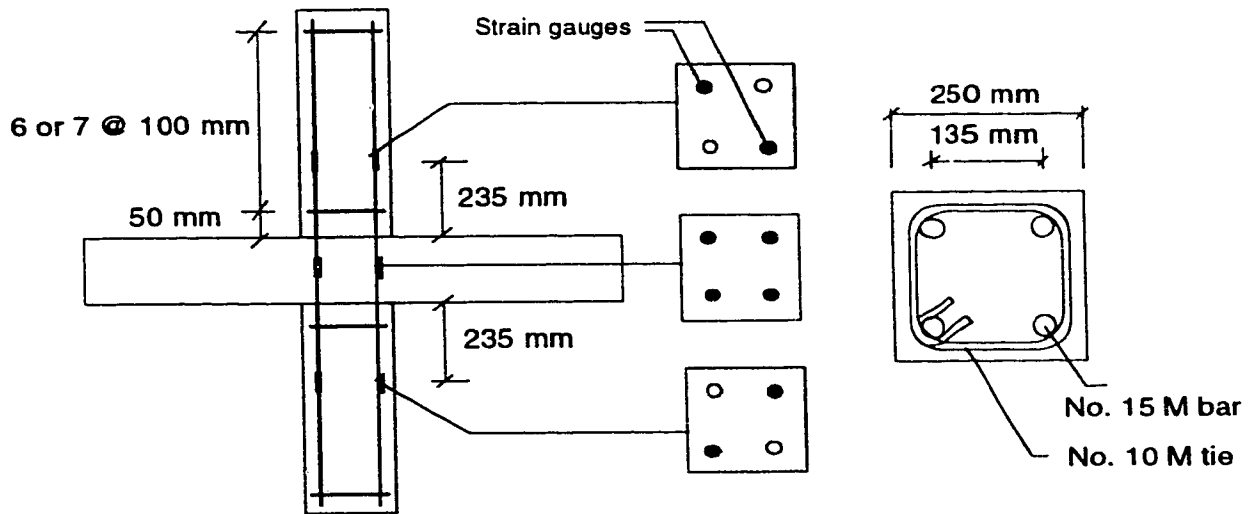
Column reinforcement and strain gauge layout (series B specimens)
